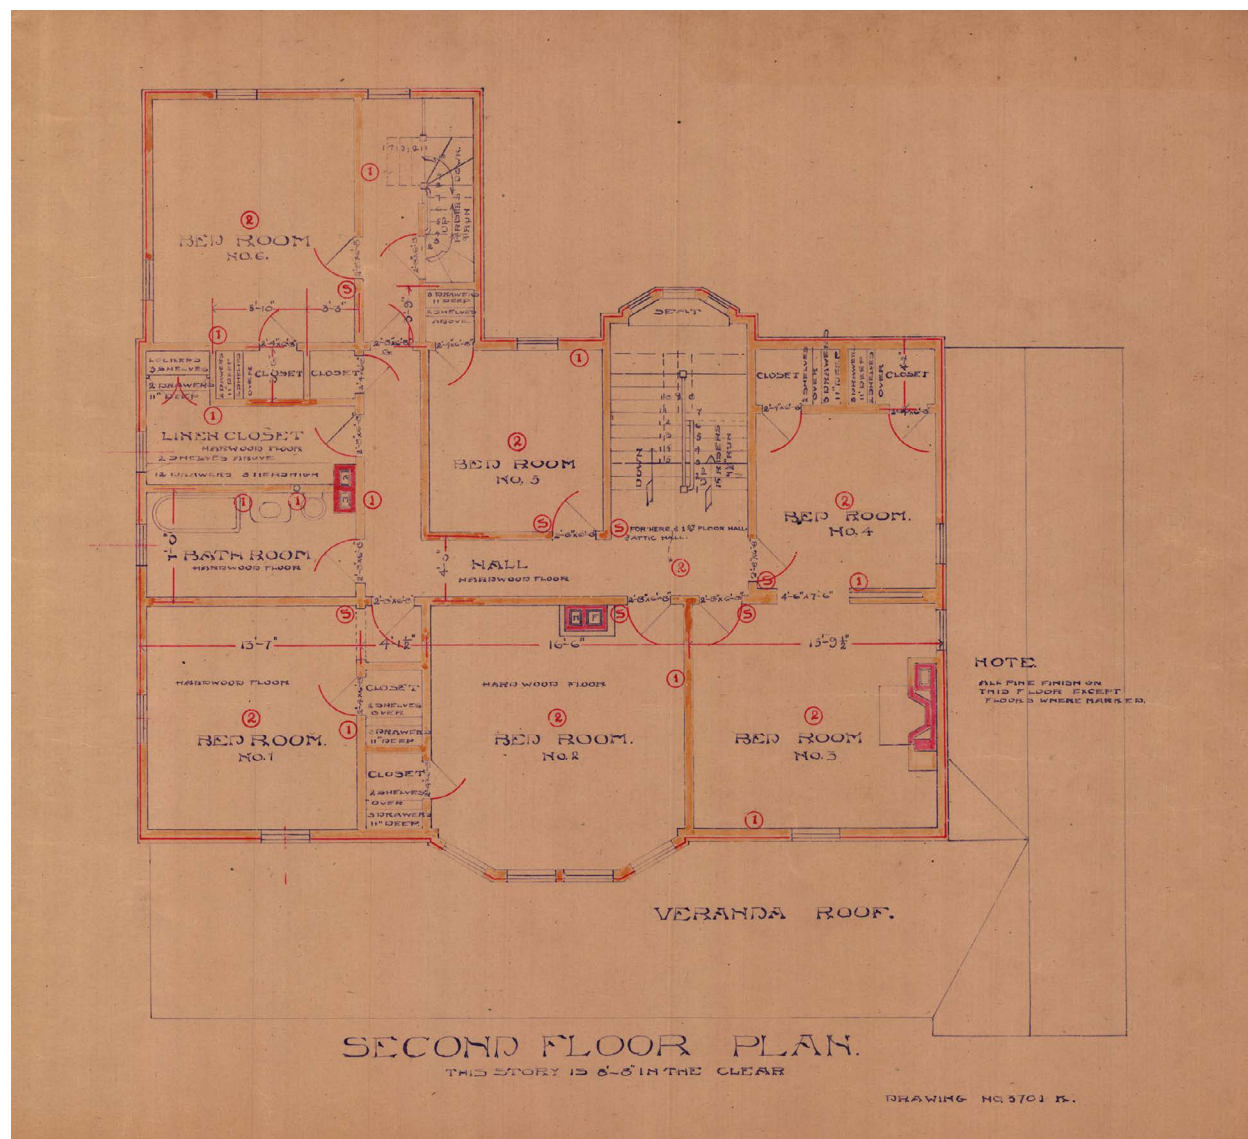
Second Floor Plan. Cooper House plans.
